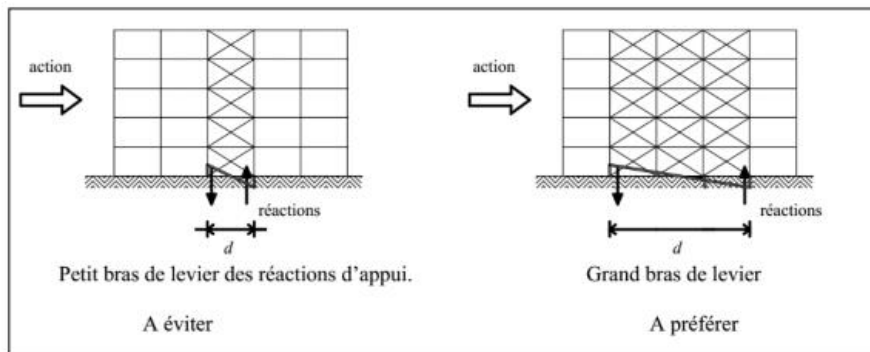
Redundancy and a broad base ensure better distribution.
